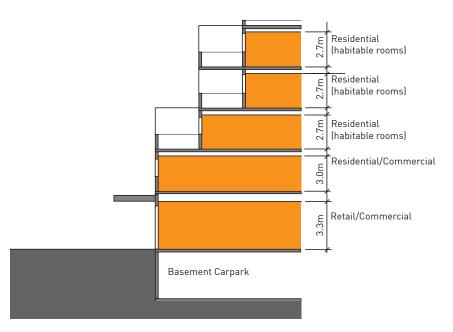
A.21-2: Internal ceiling height requirements for mixed use buildings.
